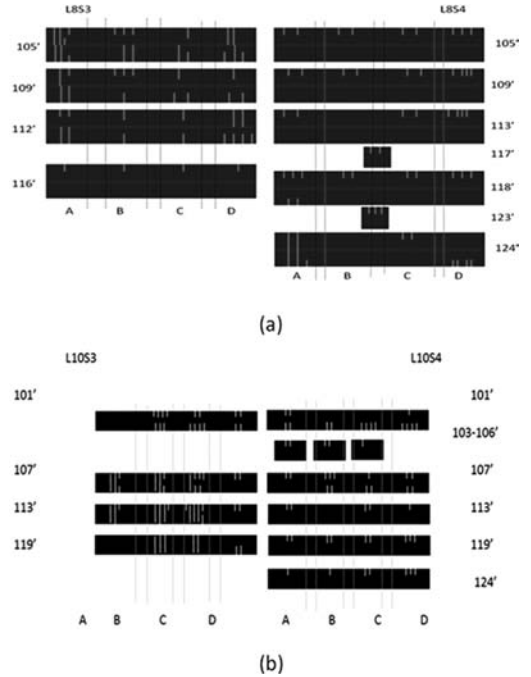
Top-down/bottom-up Cracking Patterns from Pavement Cores. [a] Cracking patterns of Lane 8 Site 3 (unaged) and Lane 8 site 4 (aged) [b] Cracking patterns of Lane 10 Site 3 (unaged) and Lane 10 site 4 (aged).
